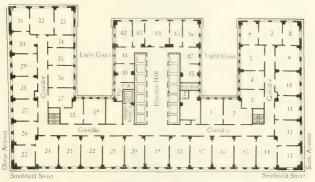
TYPICAL FLOOR PLAN, OLIVER BUILDING
